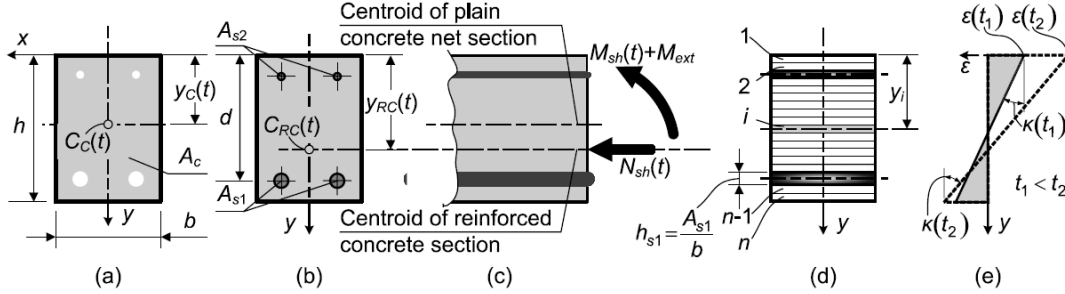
Modeling concrete section under sustained loads (Zamblauskaite et al., 2005)
